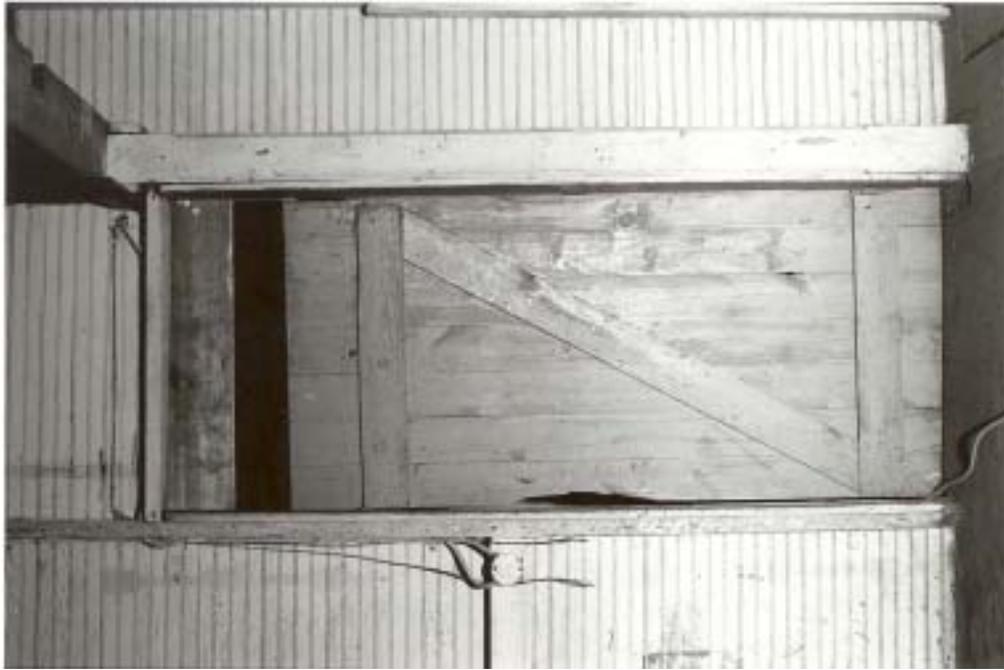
Room 201, south wall: vertical- plank door in doorway D- 22, leading to Room 203 (hall) [1993].
